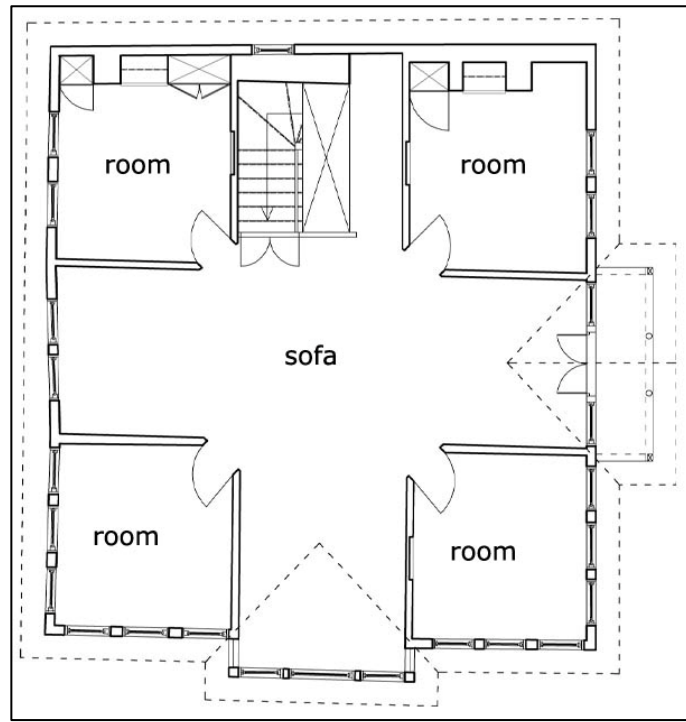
Ground floor plan of Hisar Evi, (see Appendix C)
